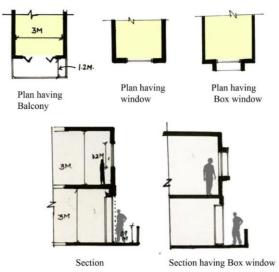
Plan & Section having Balcony and its Above Floor with Normal Window and a Box Window
